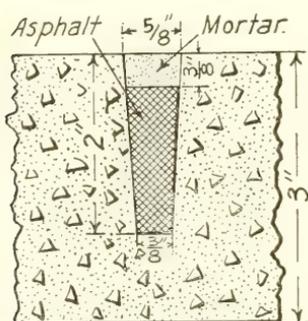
Sketch of joint used for concrete lining, Patterson Land & Water Co., Patterson, Cal.
